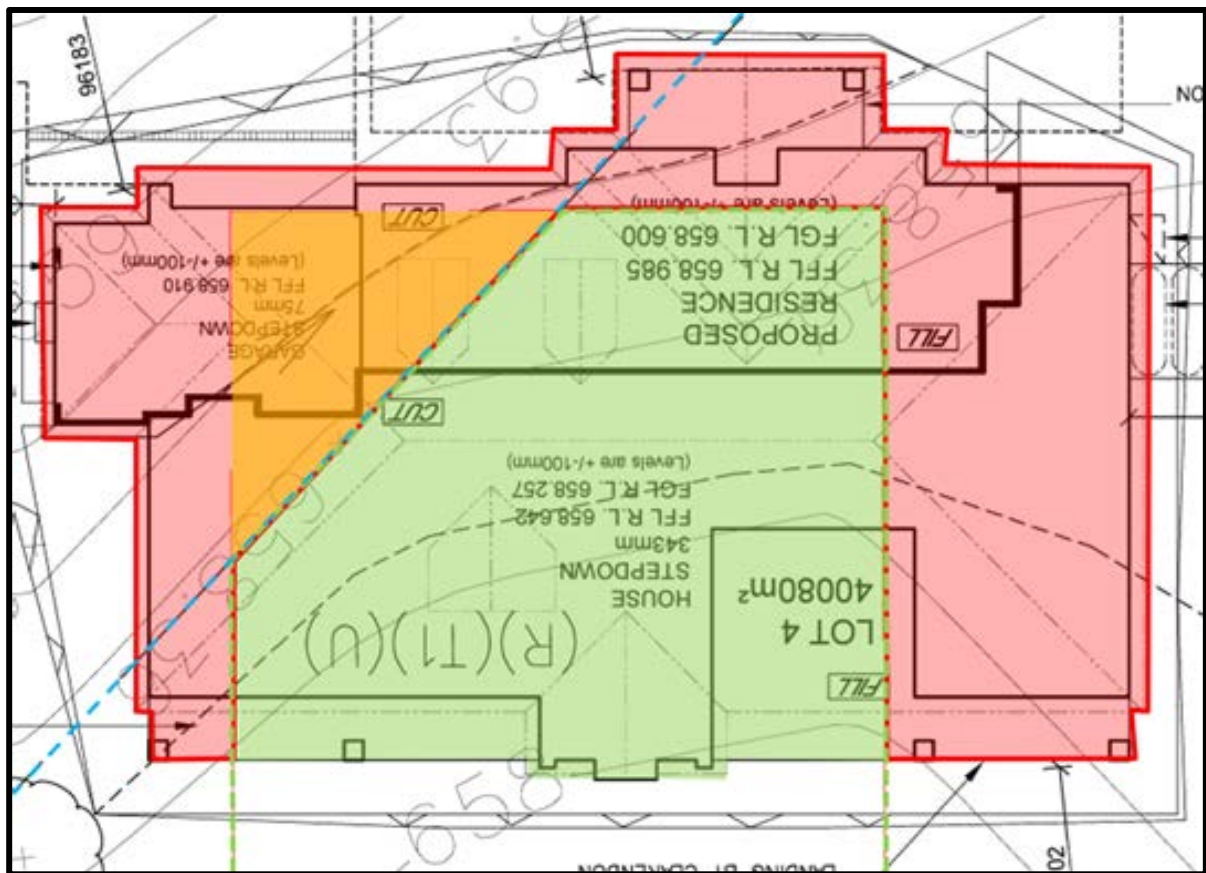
Sightline easement [S1] (blue), the acceptable development area of the approved building envelope (green), the portion of the approved building envelope that encroaches into the sightline easement (orange), the portion of the proposed dwelling which located outside of the acceptable development area (red).
